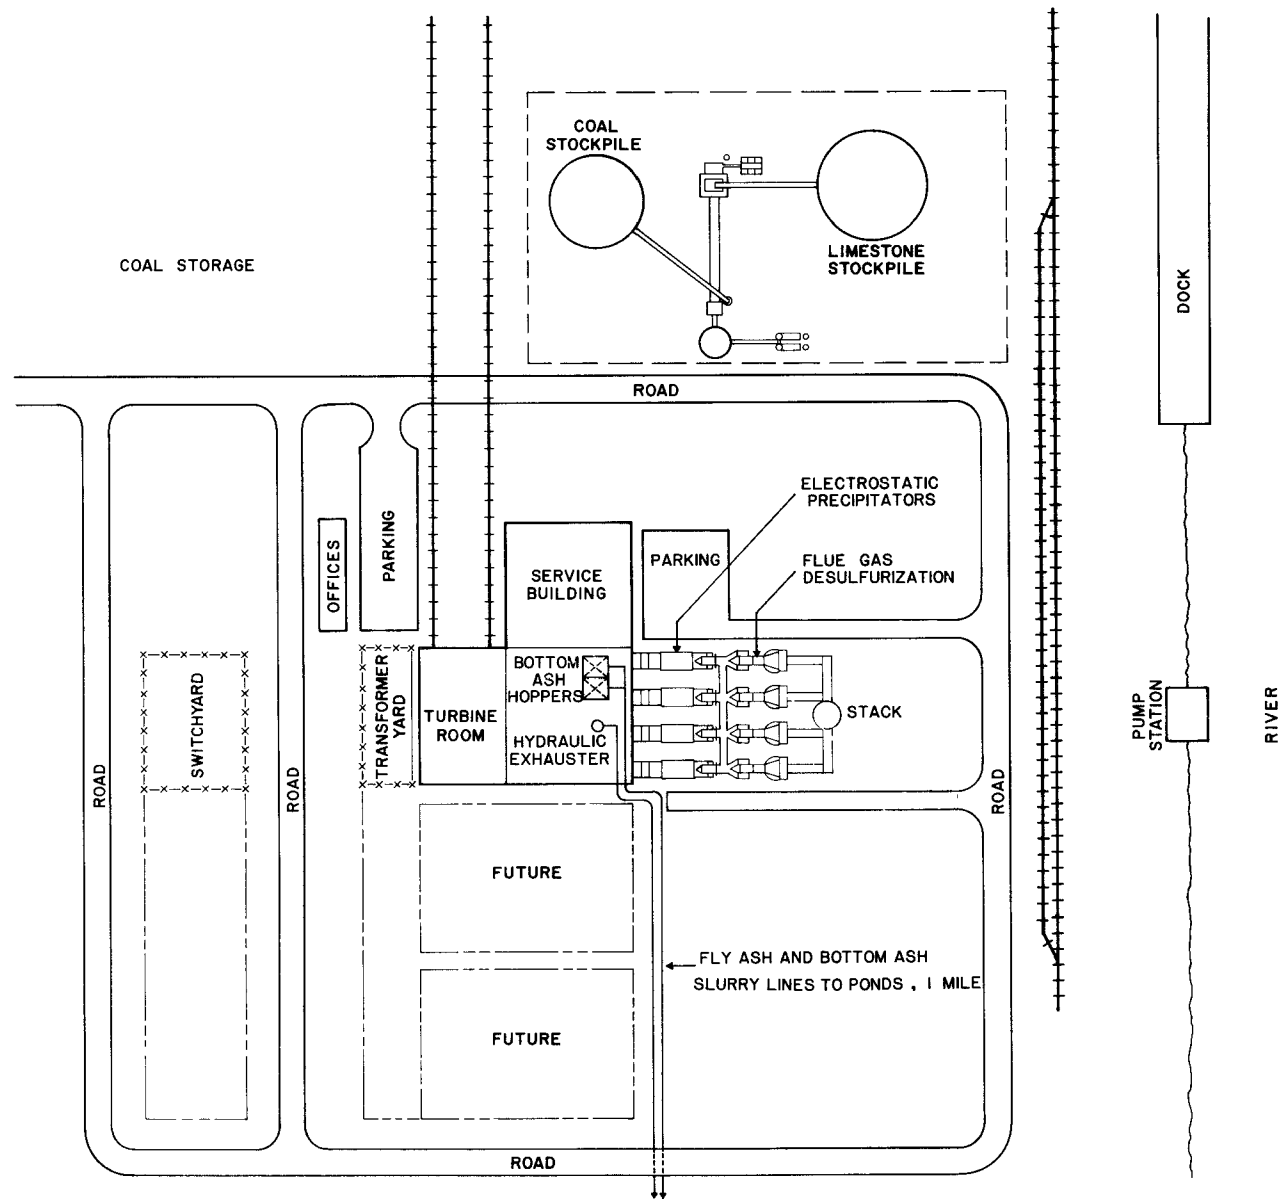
Plot plan. Base case 1, direct ponding of nonhardening ash without water reuse.
